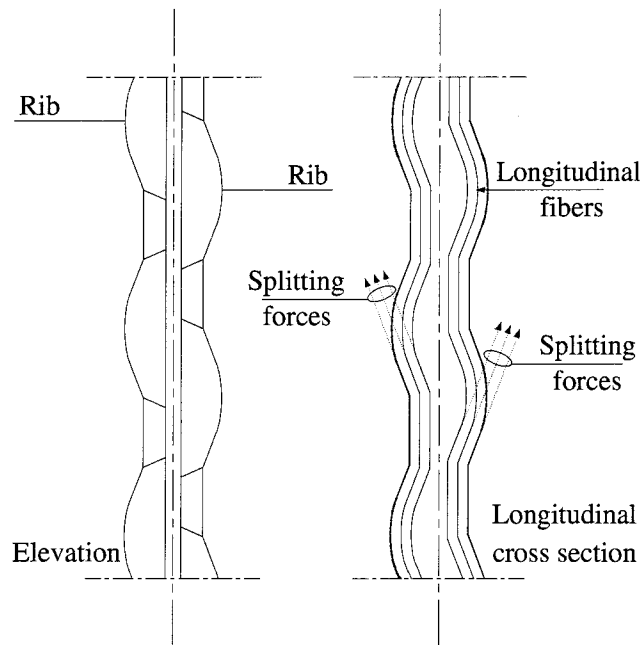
Schematic longitudinal cross section, elevation and side view of the new developed CFRP rebar
